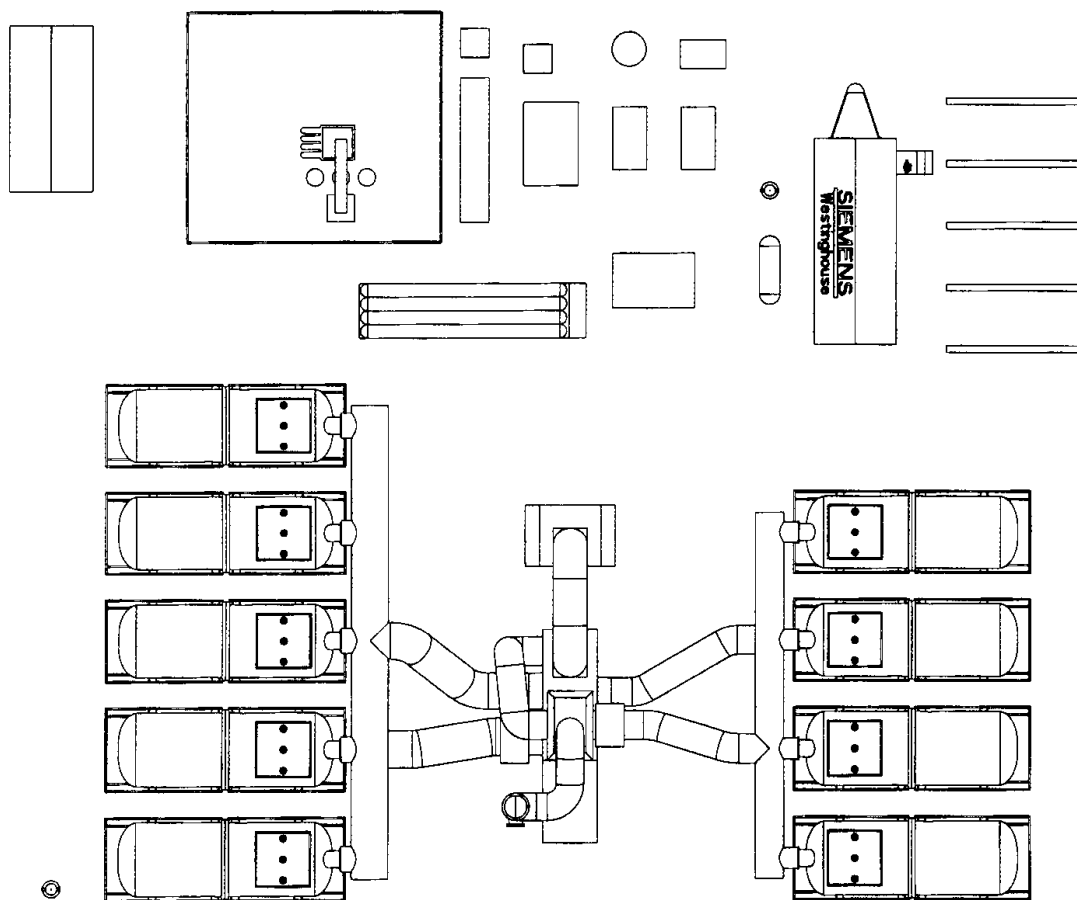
Alternative 1 System Arrangement — Plan View.
